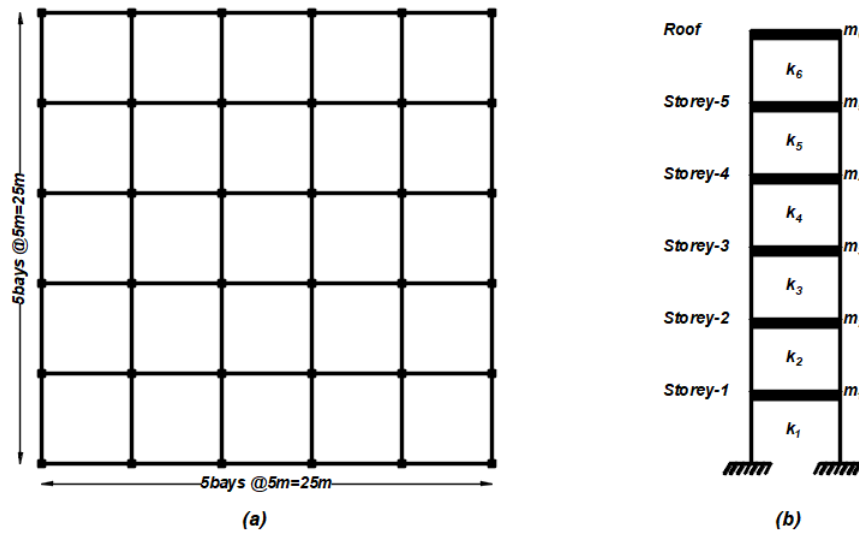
Reinforced concrete shear building (a) Plan (b) MDOF discrete mass model
